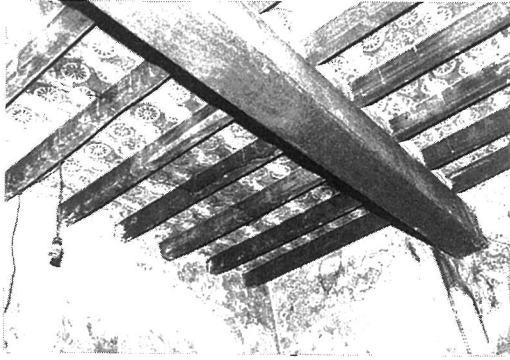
Interior view of the floor slab system of a damaged brick masonry house
